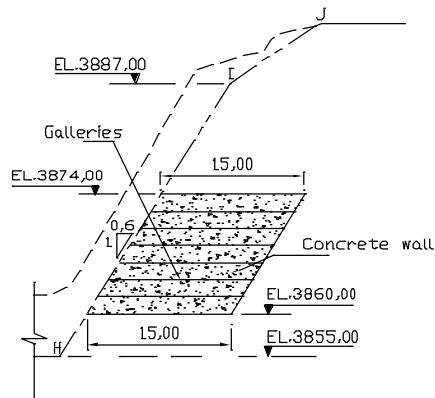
Salve Faccha dam: Galleries (longitudinal section)
